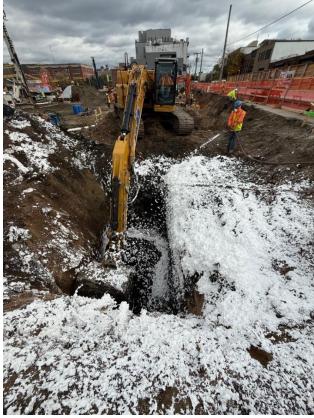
Odor suppressing foam applied to an open excavation and stockpiled non-native fill in the northern part of the site (facing northwest)
